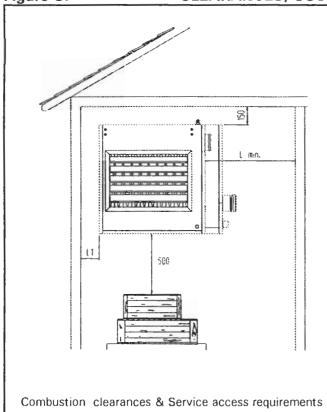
CLEARANCES, SUSPENSION & MOUNTING
